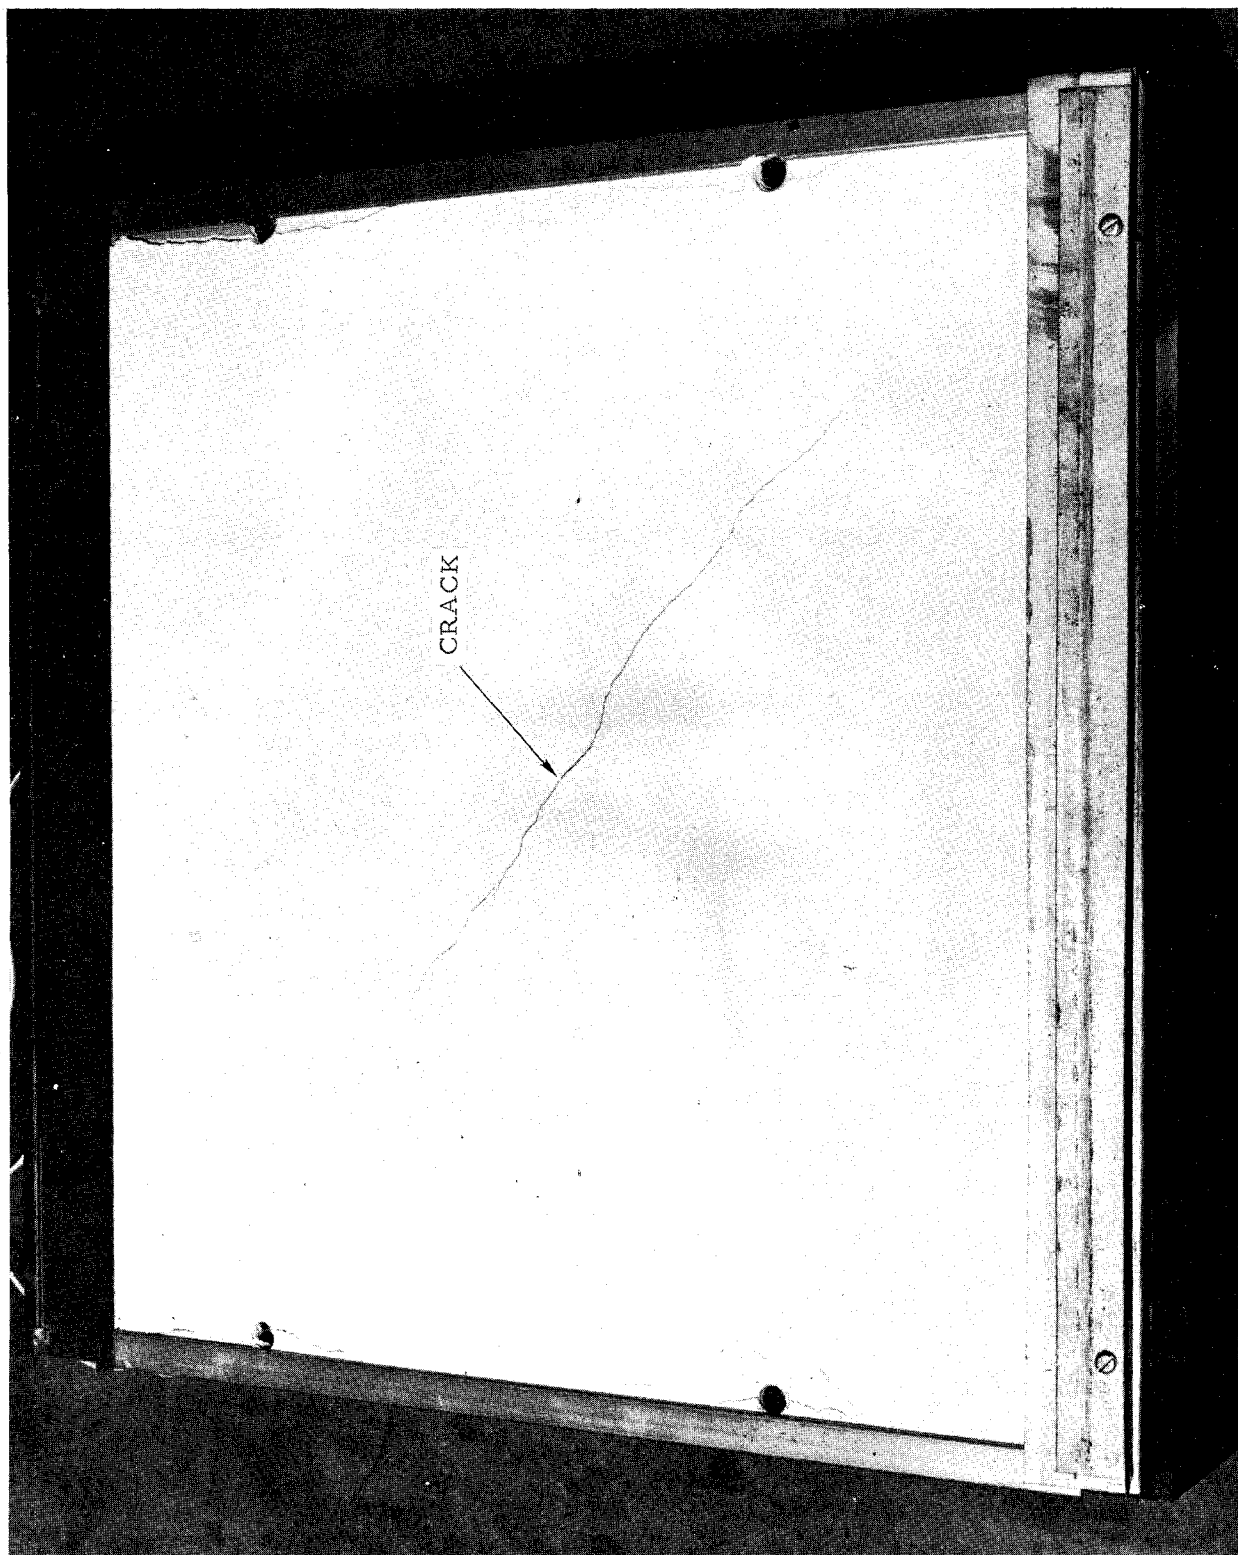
PANEL NO. 1 - WALL SECTION - INTERIOR ASBESTOS
